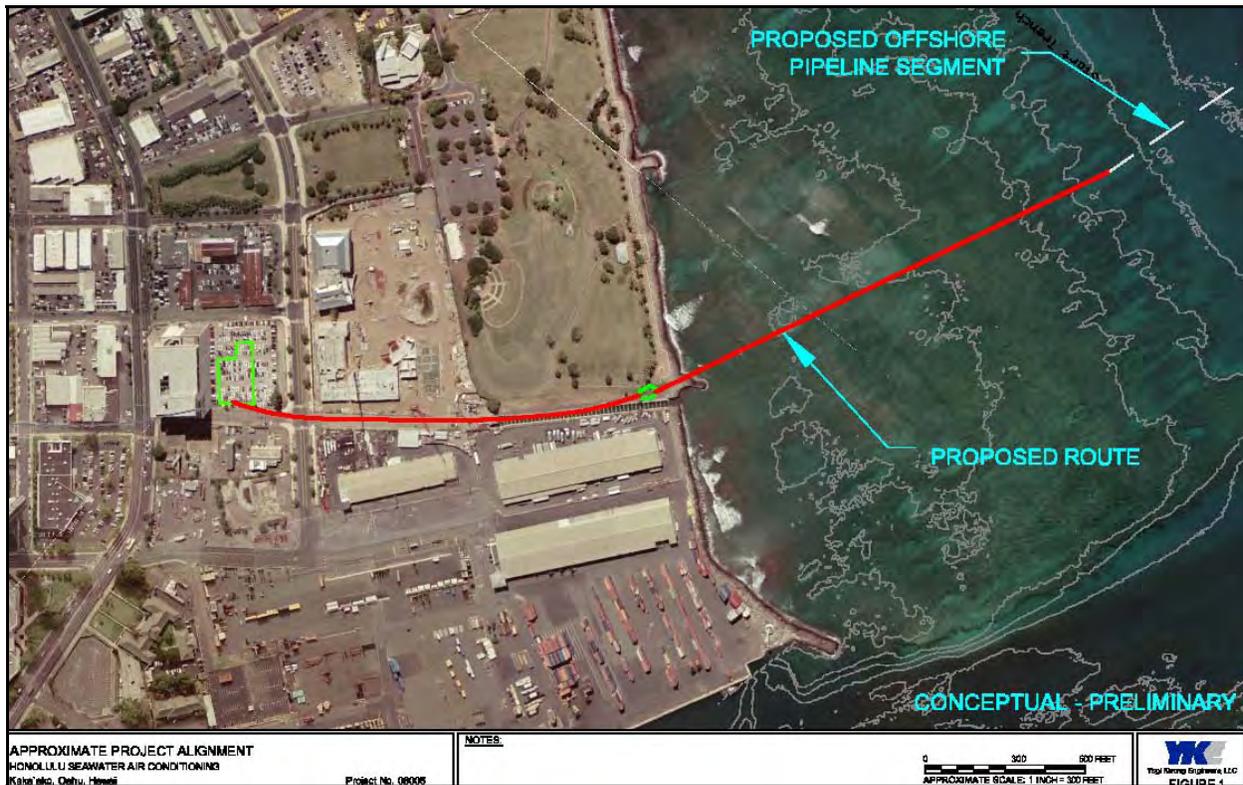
Preferred Microtunneling Route to Breakout Depth
